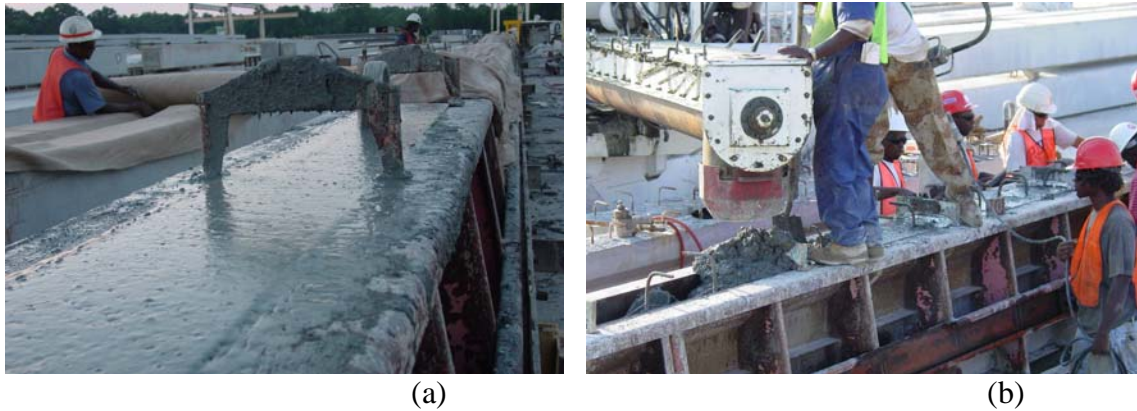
Concrete placement (a) SCC beam immediately after concrete placement (b) standard concrete mix during placement.
